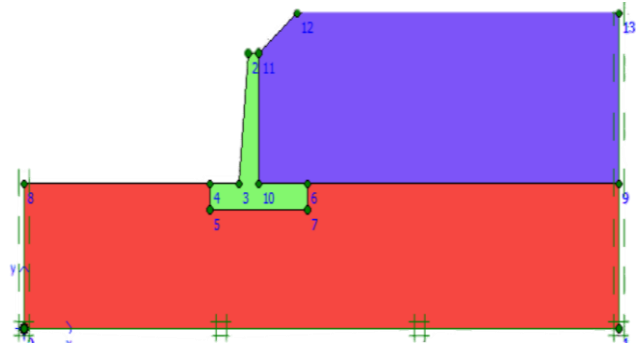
Slope modeling with reinforcement soil retaining wall existing condition in plaxis 8.2
